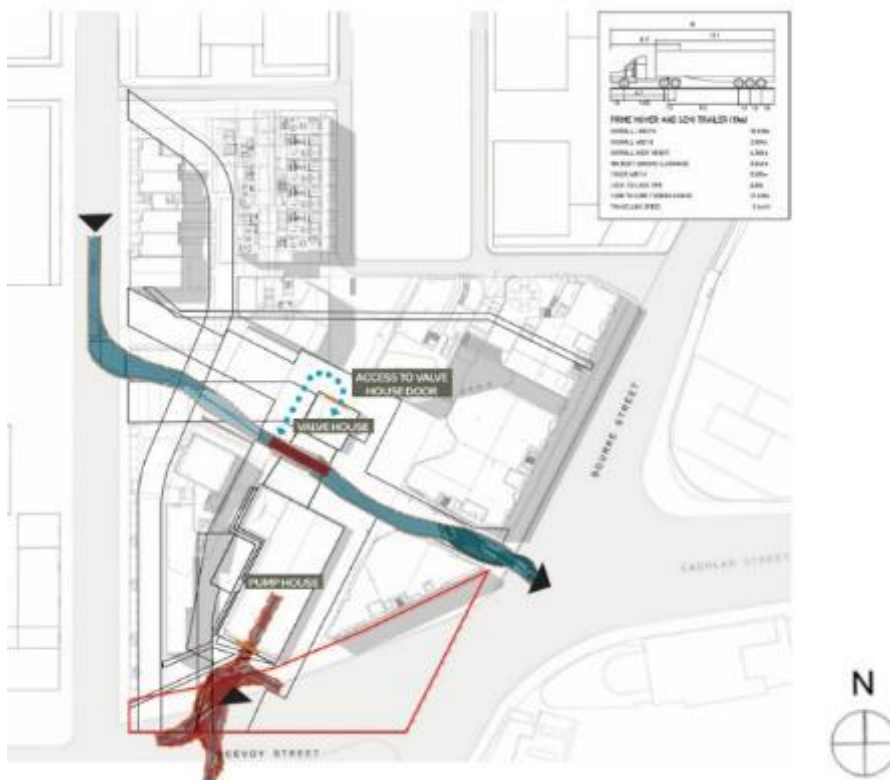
Swept paths for Sydney Water vehicles. Originally, Sydney Water articulated vehicles were proposed to service the site Valve House from Young Street, exiting onto Bourke Street (blue shading) and service the Pump House from McEvoy Street (red shading).
